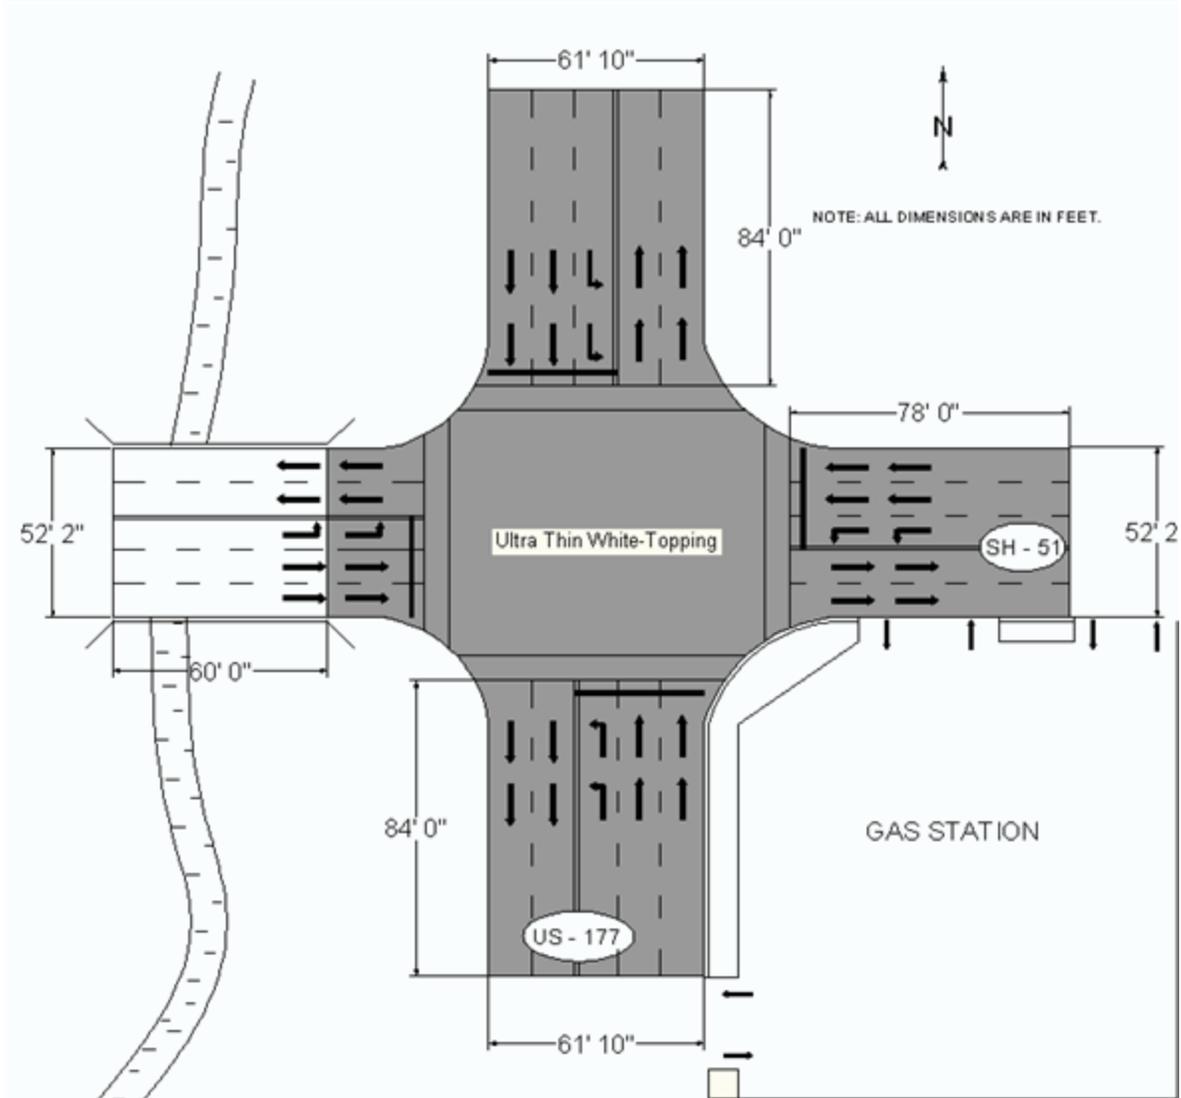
Layout of Intersection of US-177 and SH – 51 in Stillwater, OK.
